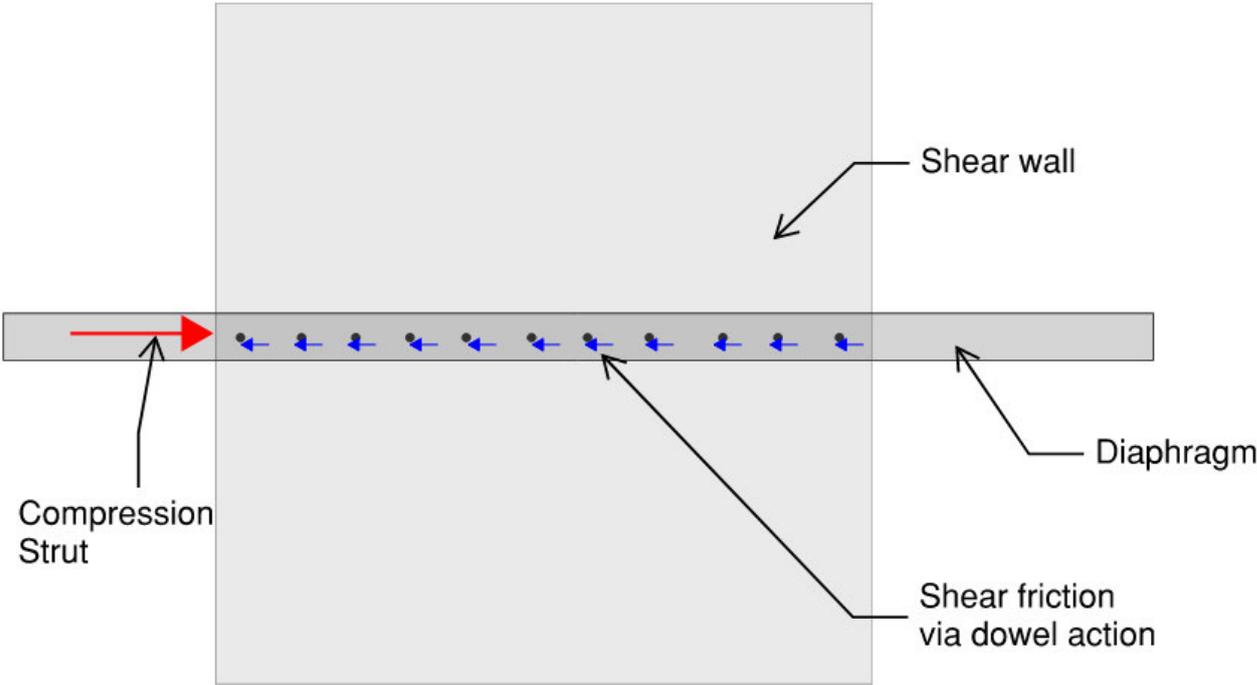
Shear wall elevation showing the load transfer mechanism
